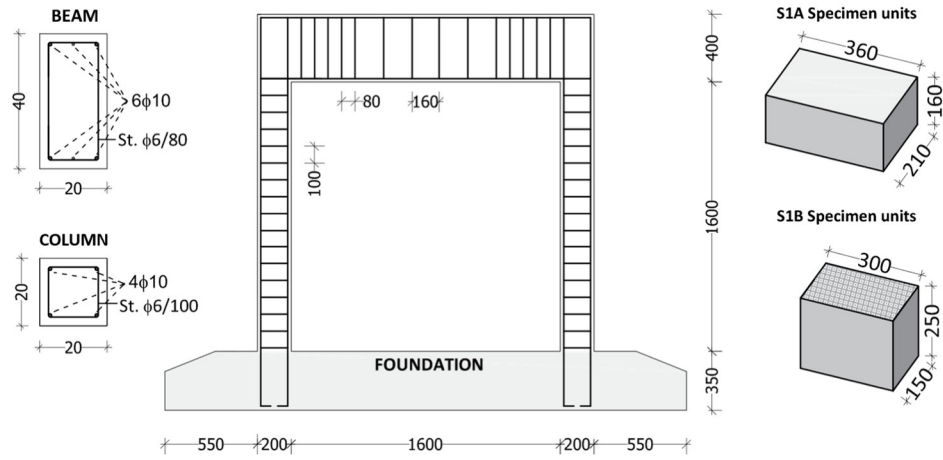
Cavaleri and Di Trapani (2014) S1A and S1B specimens' detail (dimensions in mm).
